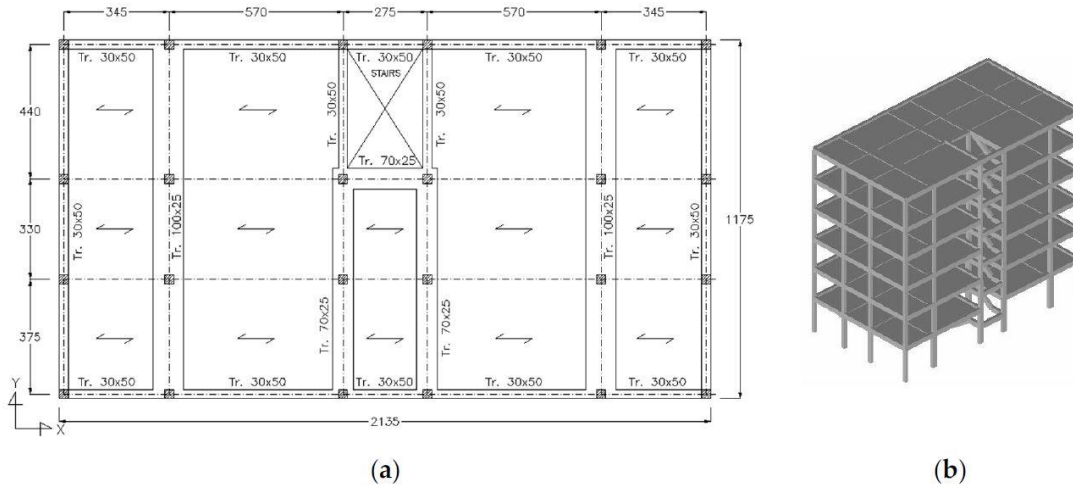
(a) Floor plan of the building of study, (b) 3D view of the model. (Manfredi et al. 2018)
